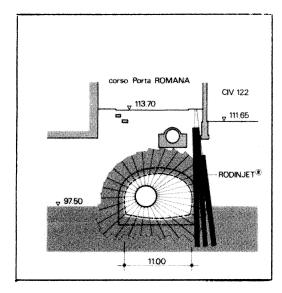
Radial permeation grouting from pilot, and jet grouting from surface to protect ancient building. Milano Metro
